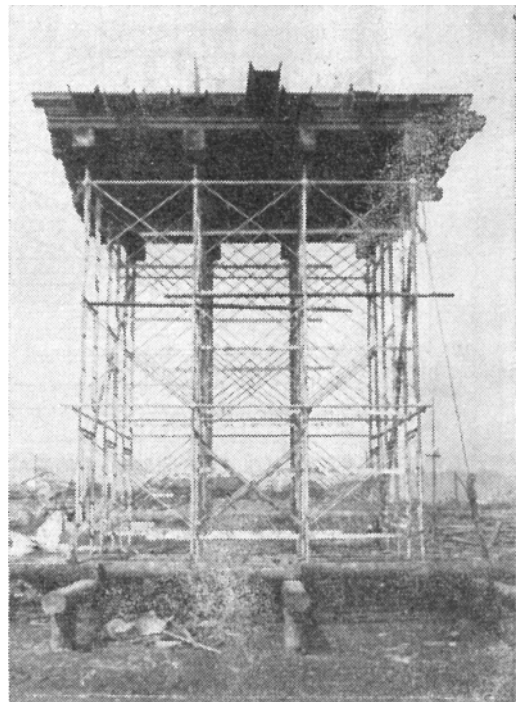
Load test for a pipe scaffolding structure (Muto 1961).
